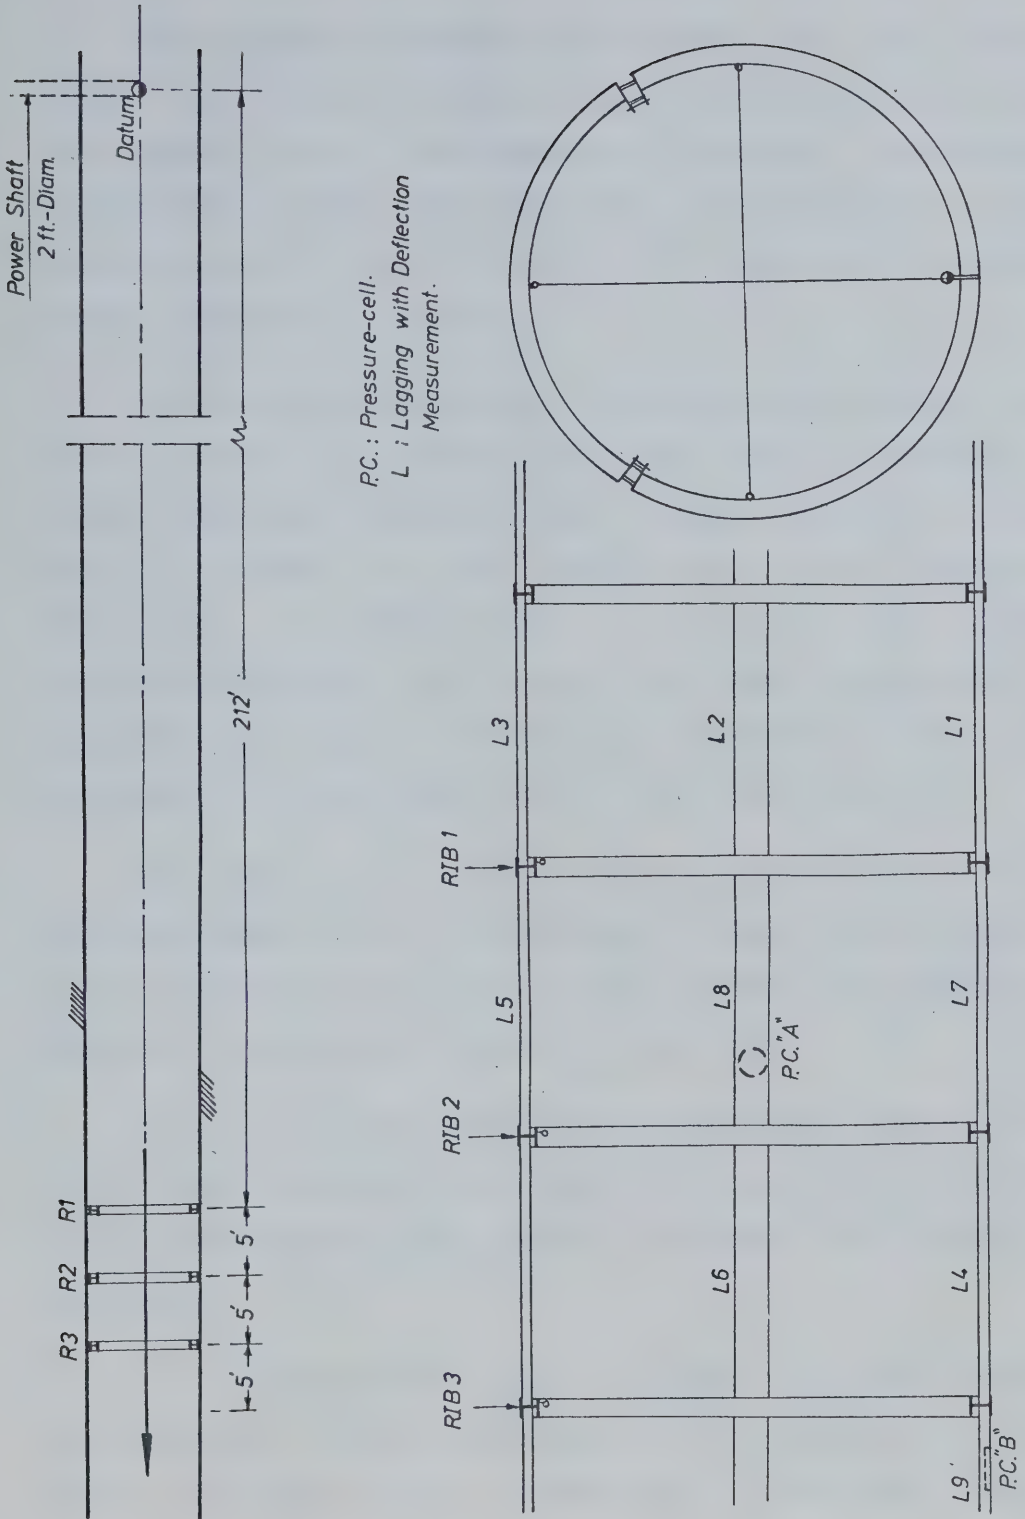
Details of the 170th Street Tunnel Test Section.
